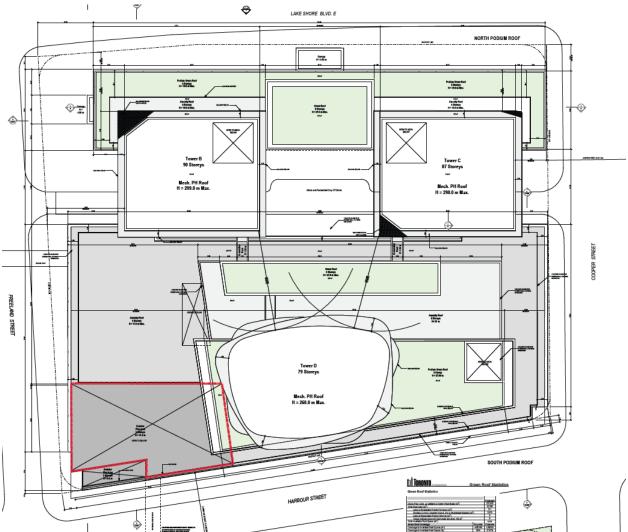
Roof plan, showing tower locations and 3rd floor outdoor play space for school (outlined in red)
